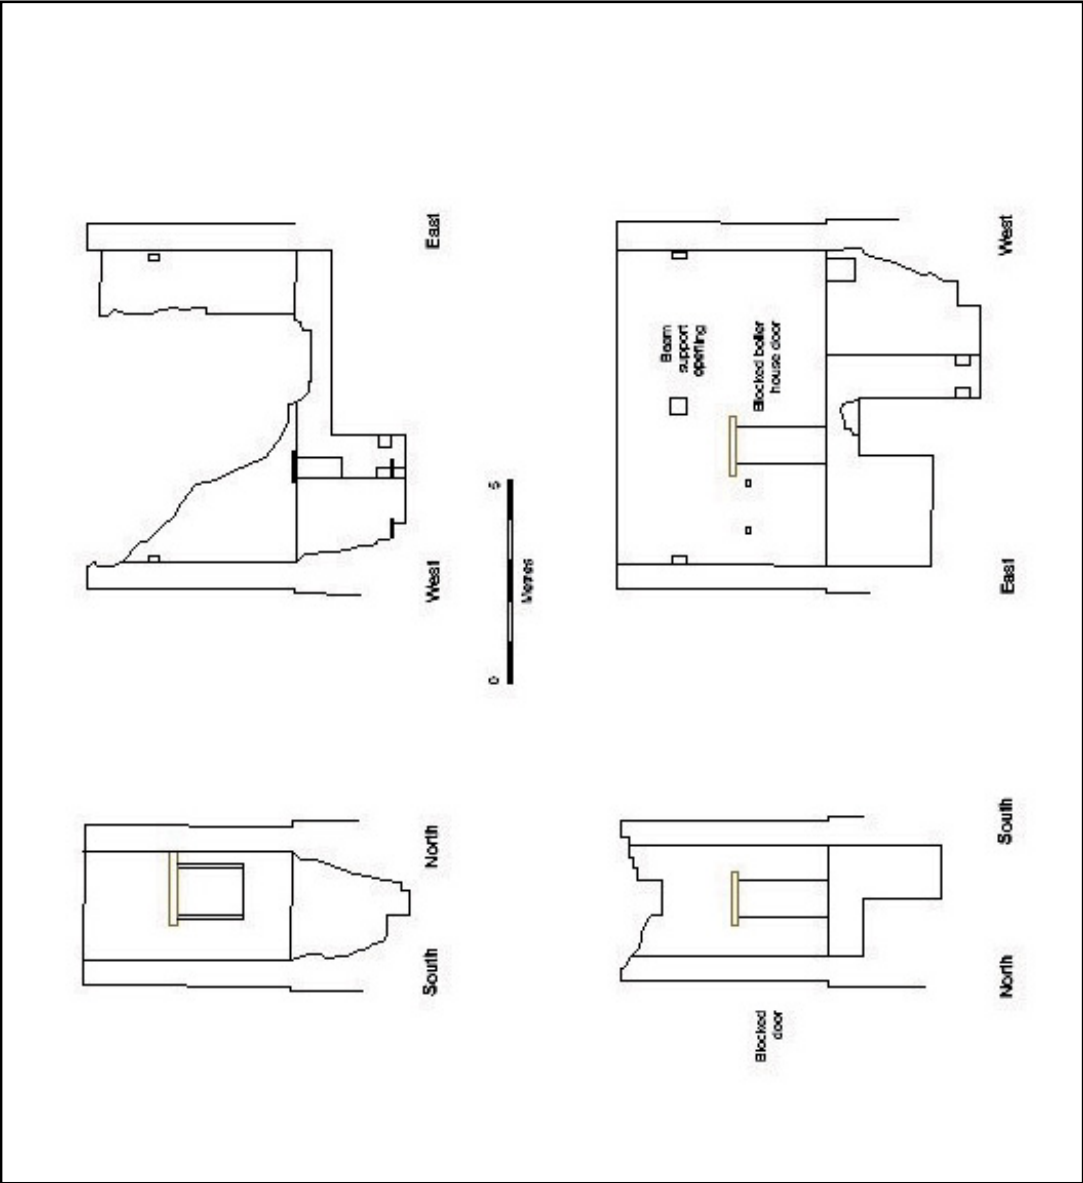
Internal elevations of Wheal Coates beam whim engine house [190378].
